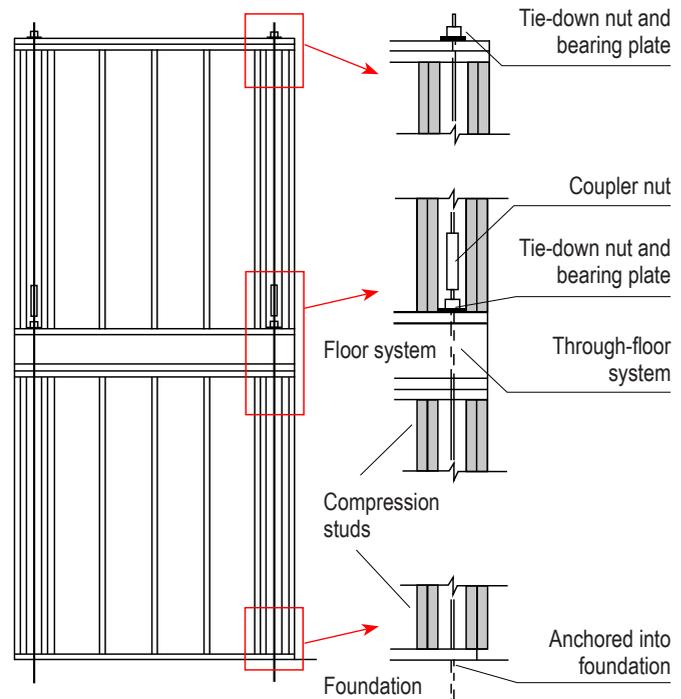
Elevation view of two-stories of a typical mid-rise wood light-frame shear wall stack.
